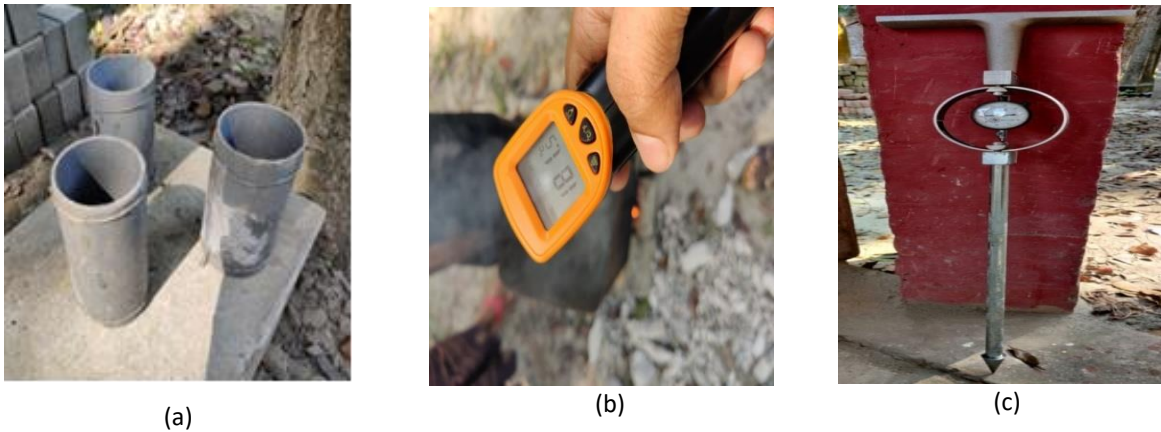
(a) Cylindrical mold, (b) Laser thermometer and (c) Proving ring penetrometer
